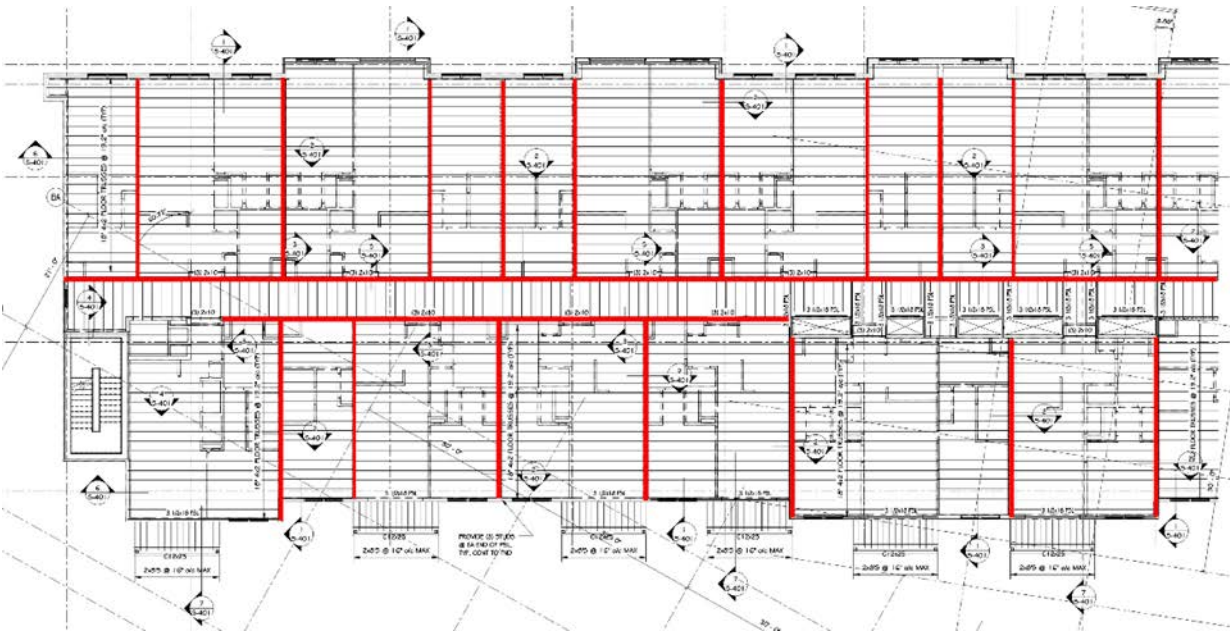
Third Floor Framing Plan (Wood Shear Walls highlighted)
